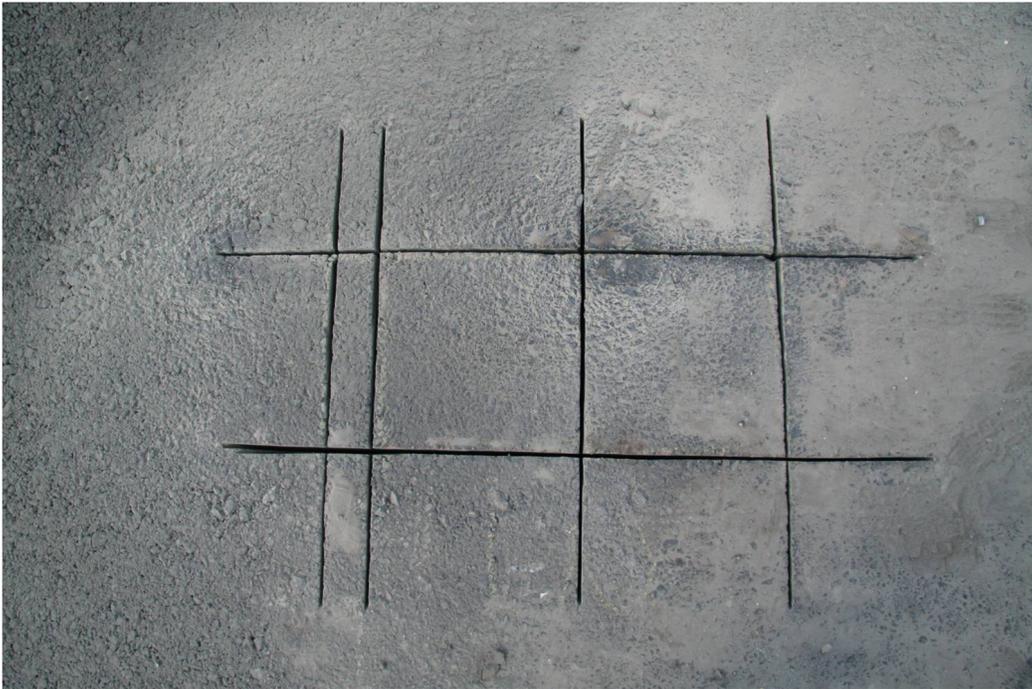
Saw Cuts in Pavement to Obtain Pavement Blocks
